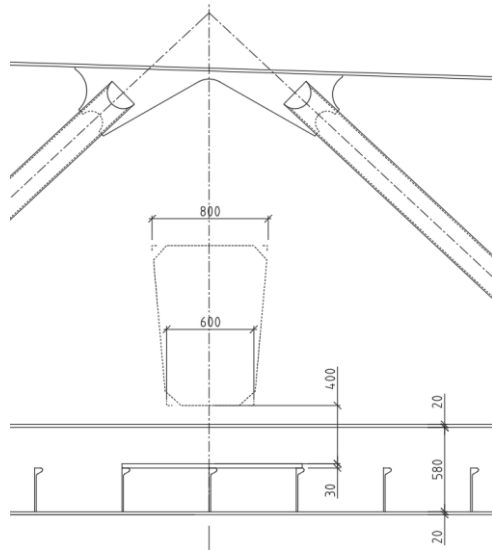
Outline for manhole in Transverse truss for 7200 mm column
